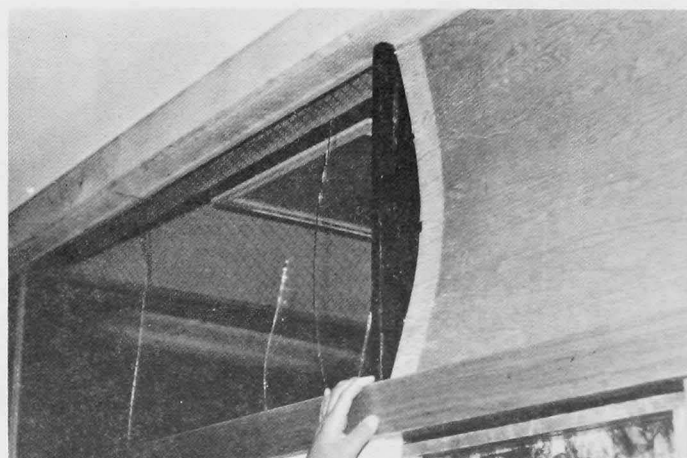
Plywood replacing broken glass caused by 3 in. of heave in 5 months at college in Pueblo.
